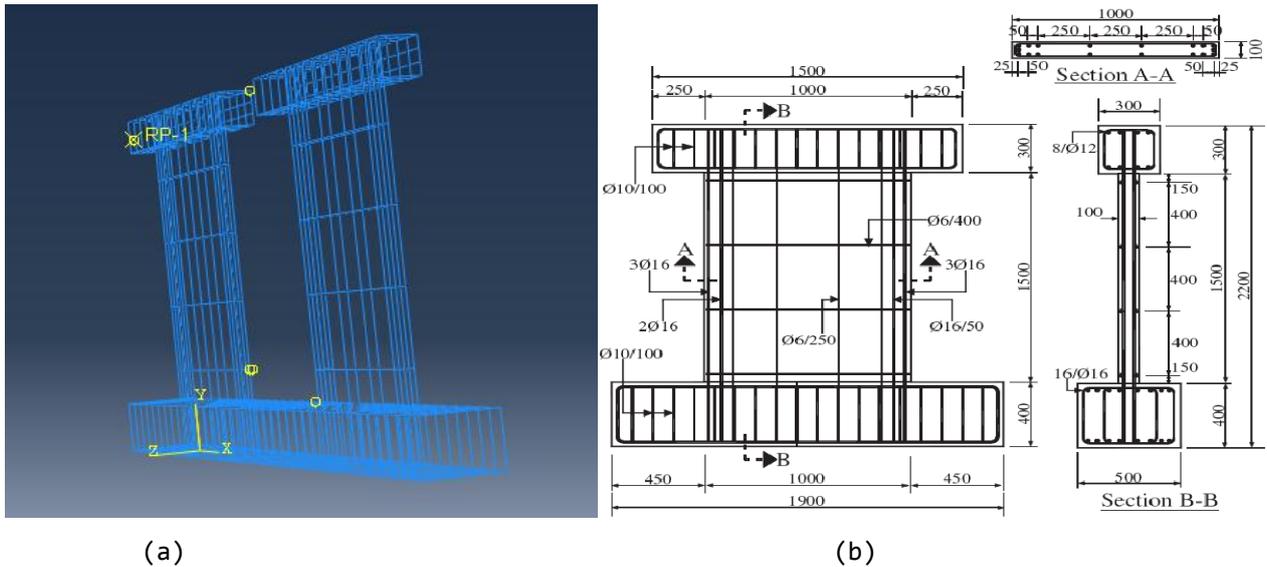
(a) Reinforcement details of test specimens (dimension in mm) [22] (b) Modeling of rebars in ABAQUS.
